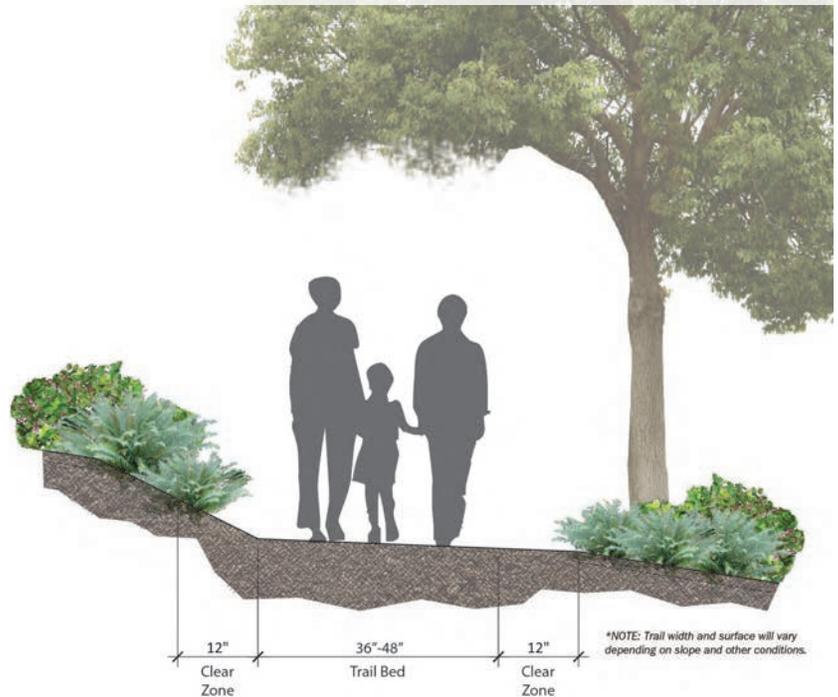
Street Demonstration Plan - Pedestrian Connections
